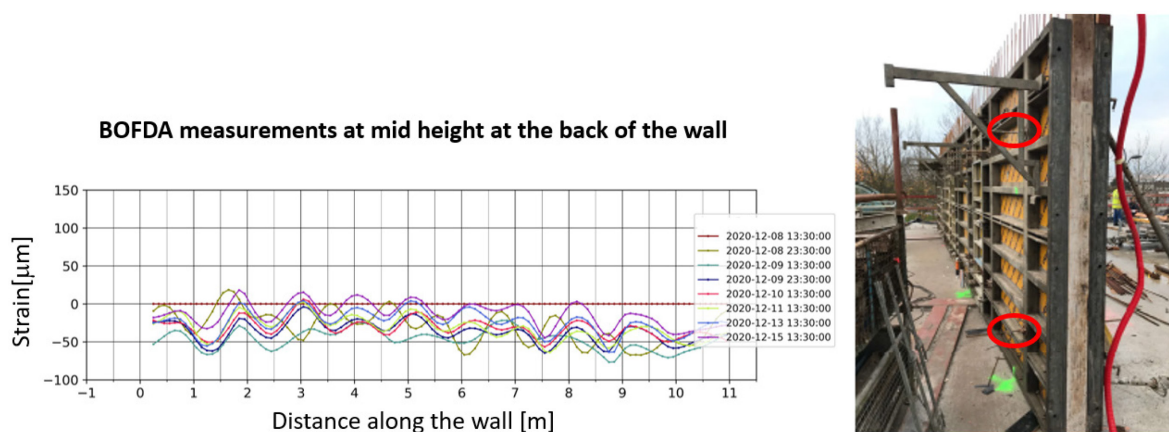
Strain profile observed along a thin concrete wall cast with a double sided formwork system.
